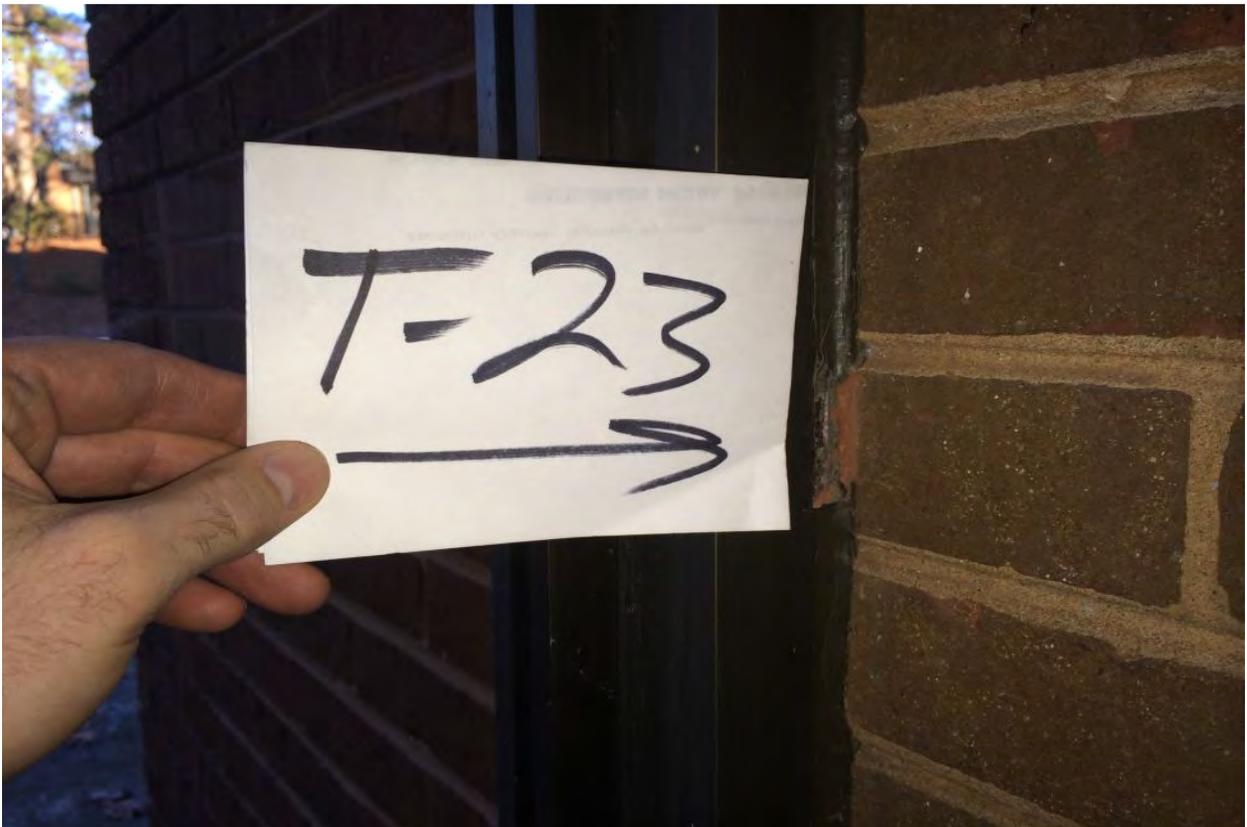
Laboratory analyses did not detect asbestos minerals within the window caulk sample TS-23 collected from the Theatre Building windows.
